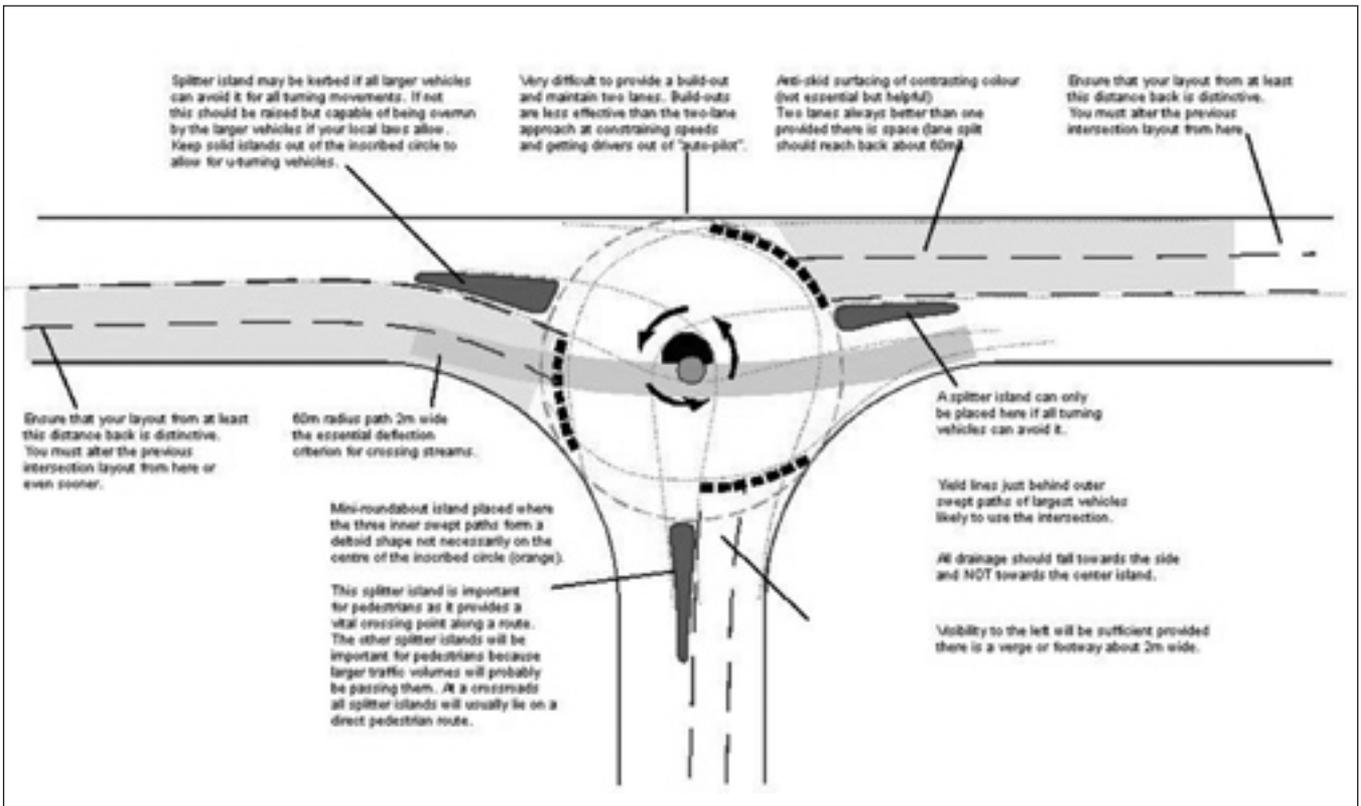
The typical design of a mini-roundabout at a large T-intersection.
